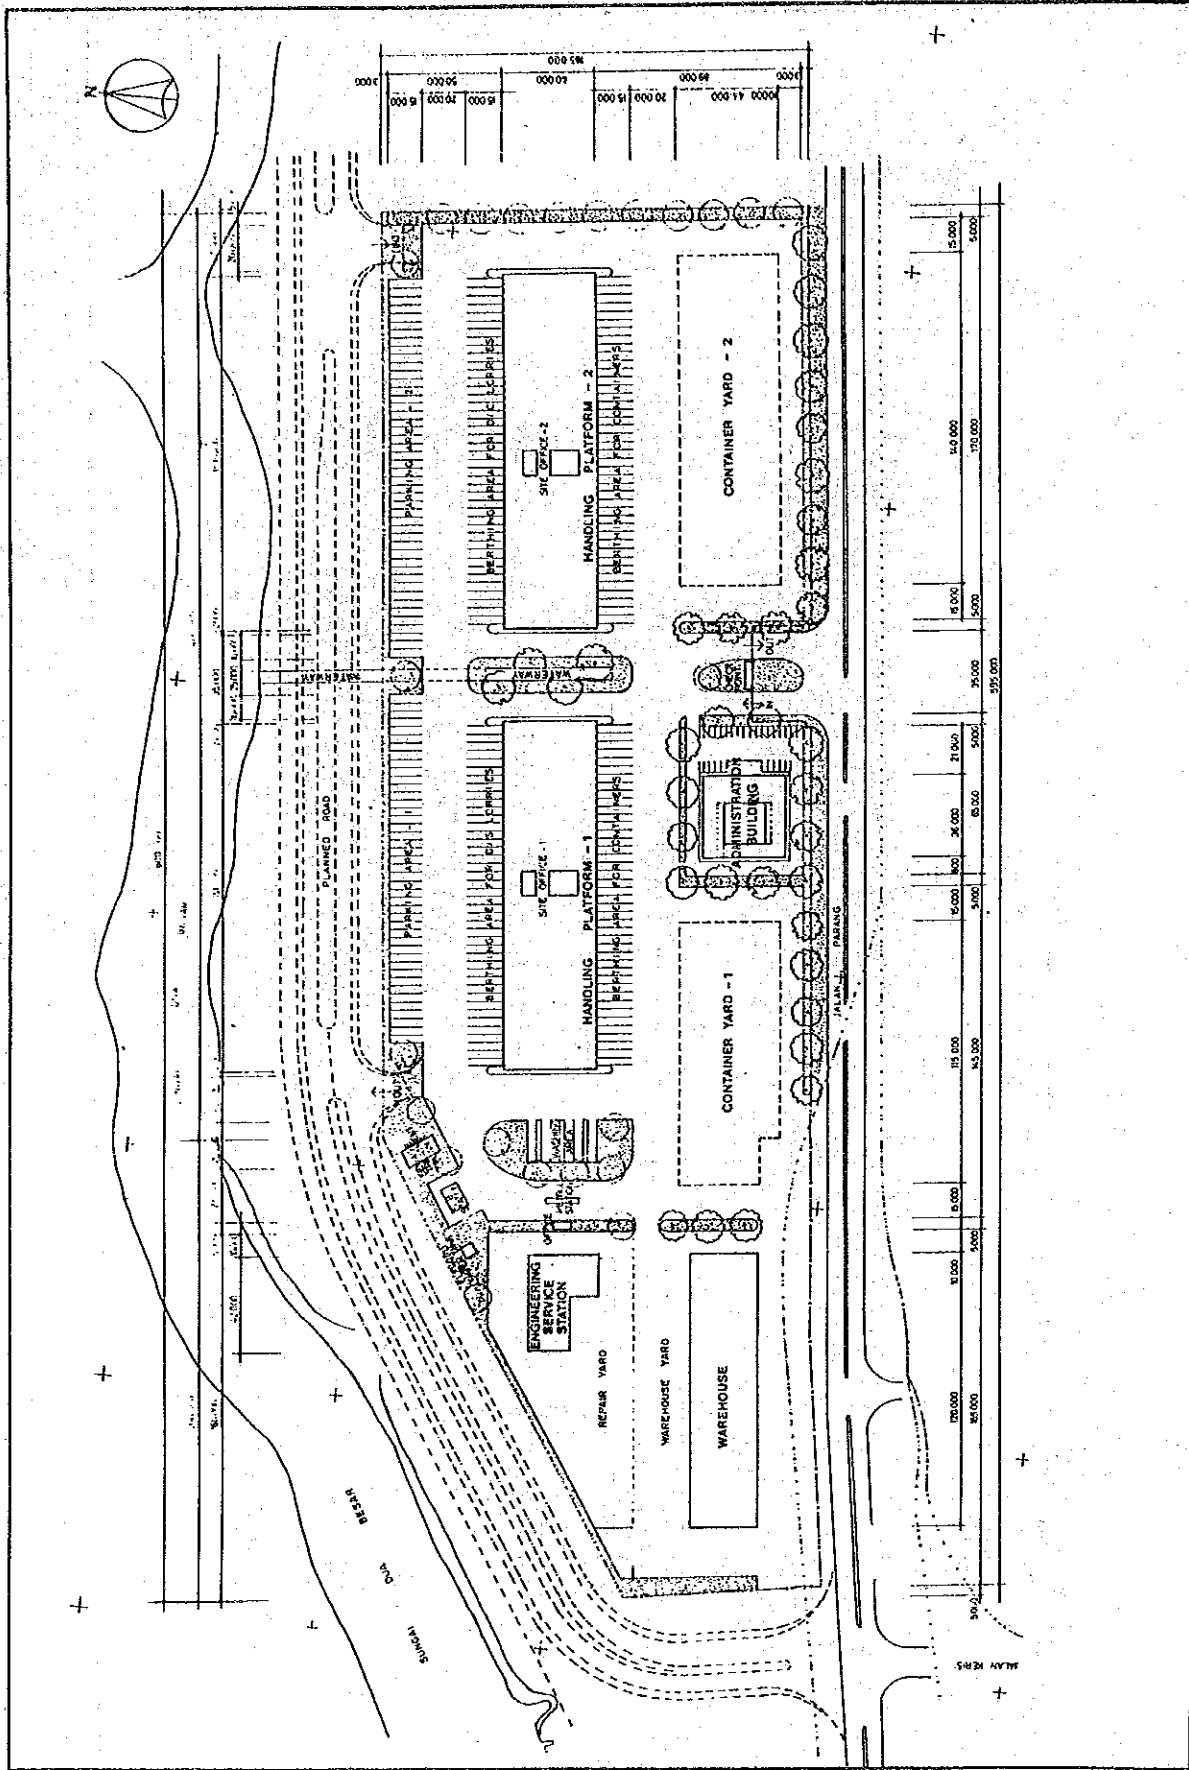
Layout Plan of Multi-modal (West) Terminal
